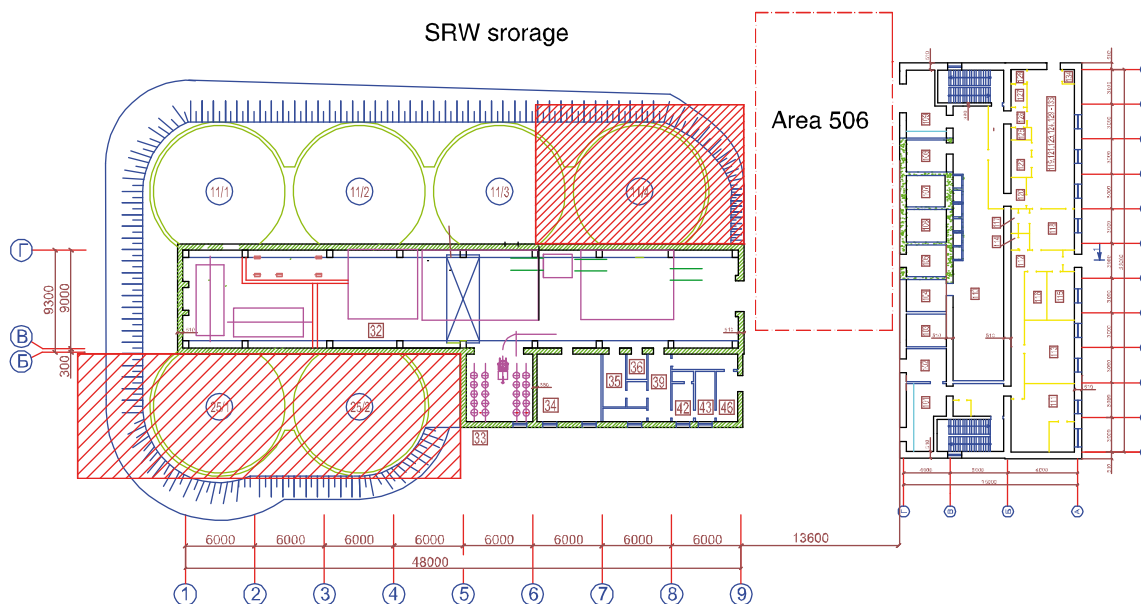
Layout of buildings and shelters for LRW treatment equipment for the alternative option
